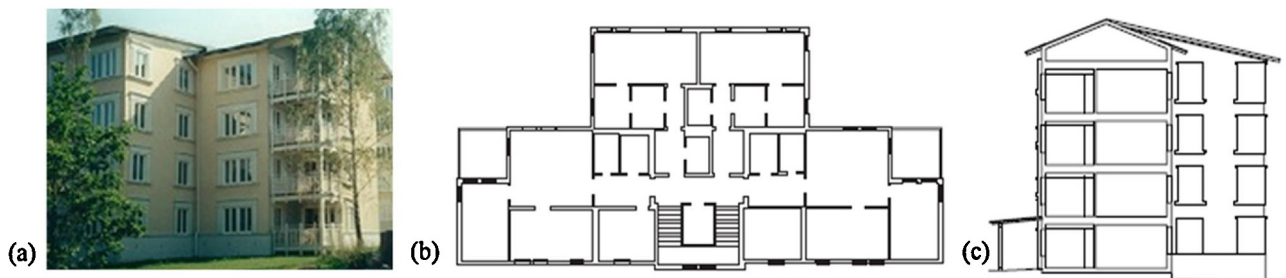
Photograph (a) and sketch of ground floor plan (b) and vertical section (c) of the reference building.
